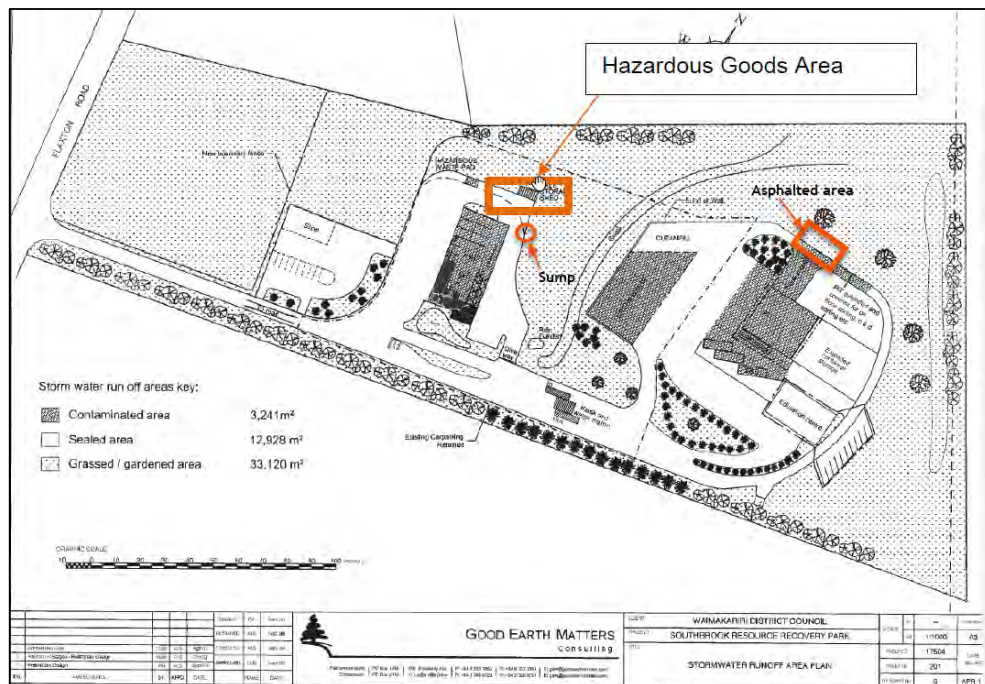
Stormwater Runoff Area Plan Showing Areas of Non-Compliance
